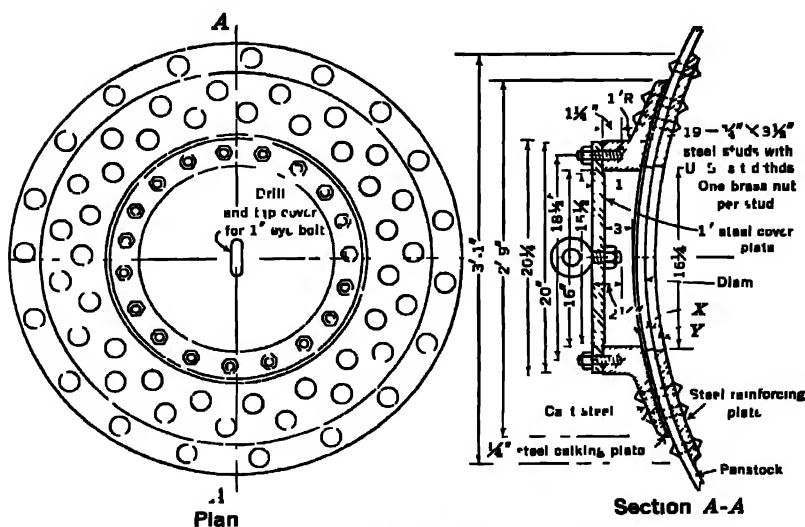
Manhole for steel pipe Los Angeles Bureau of Power and Light ("Penstocks" E. E. I. Hydraulic Power Committee p. 36, 1936)
